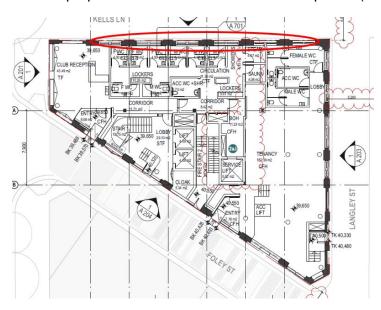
Proposed windows to be widened along the Kells Lane elevation circled in red
